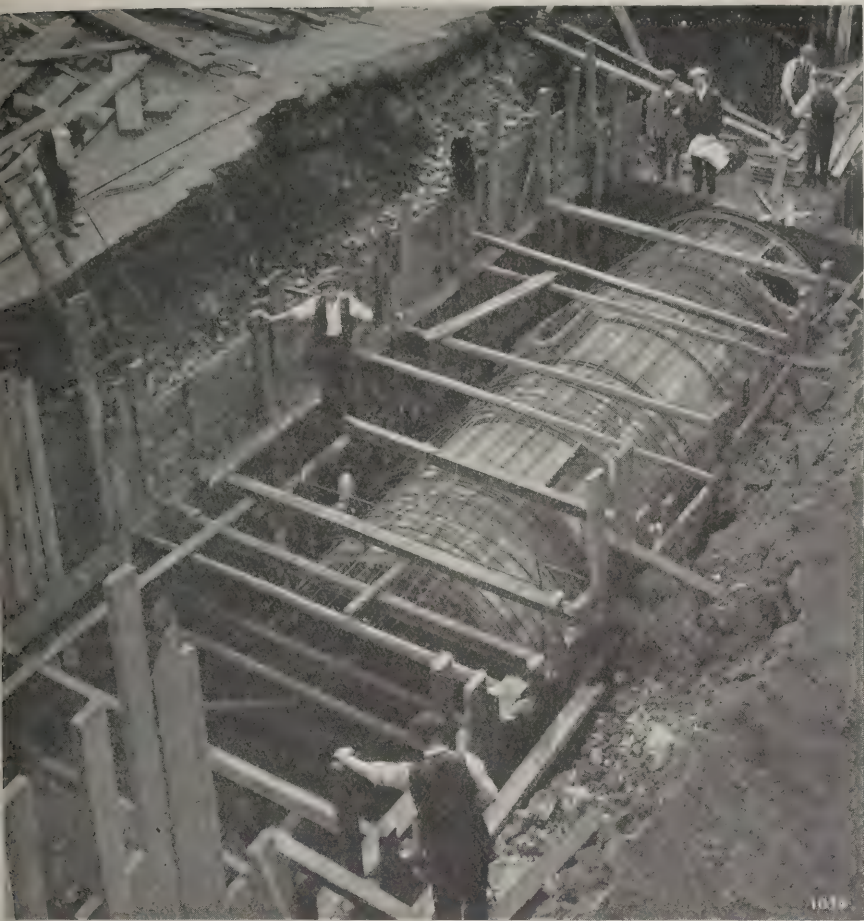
TUNNEL IN COURSE OF CONSTRUCTION.
